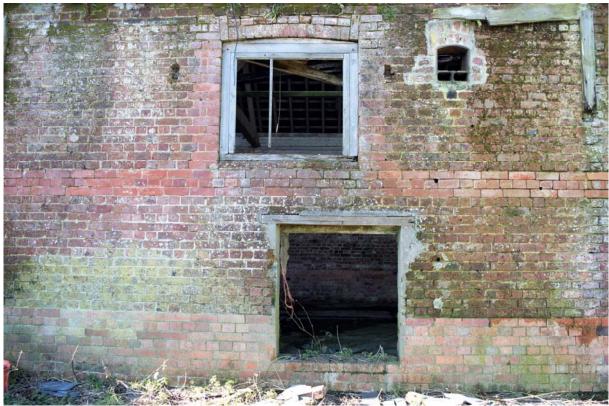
Inserted windows and openings on the east elevation of the barn, facing west (GIL18-0006)
